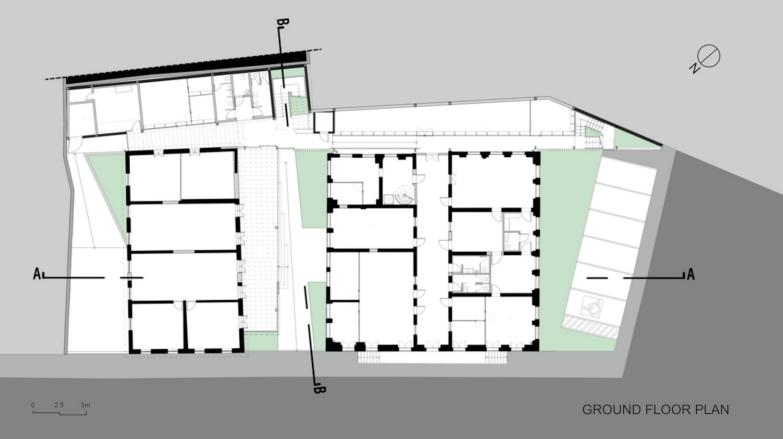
Ground floor plan by A+P Arquitetos Associados [Source: ArchDaily.]
